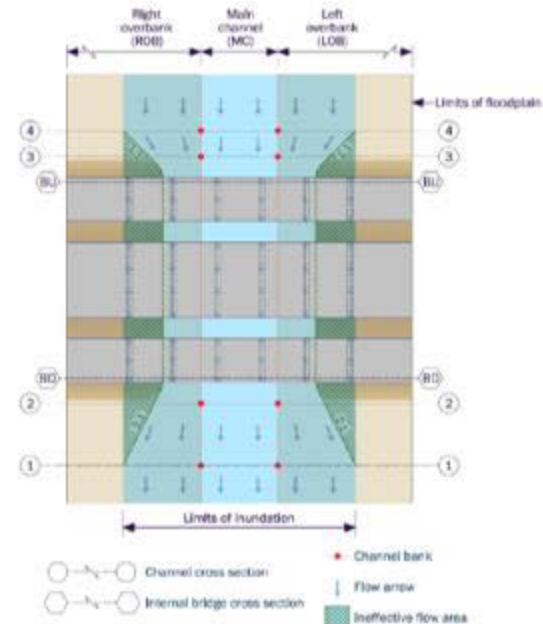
Parallel Bridges on Shared Embankment: Idealized Cross Section Layout
